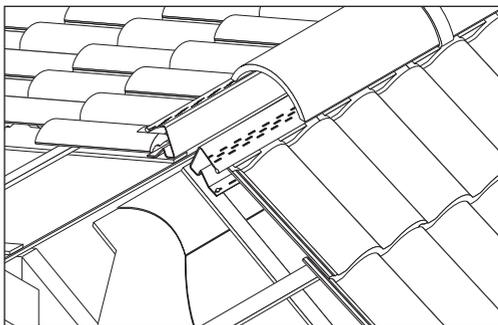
Tiling battens and counter battens at ridge (with Marley ventilated dry ridge system)
